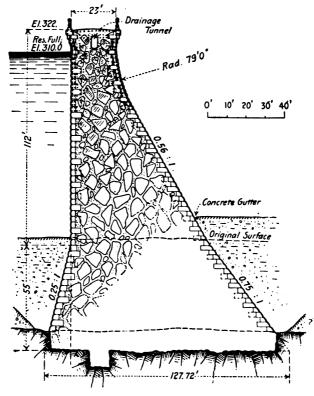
Section of Croton Falls dam, New York; built 1906 to 1911; cyclopean masonry; concrete block faces; 1100 ft. long; max. height 173 ft.; contains 290,540 cu. yd.: masonry all kinds.
